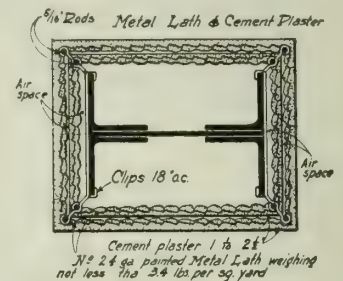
DOUBLE WALL COLUMN PROTECTION
